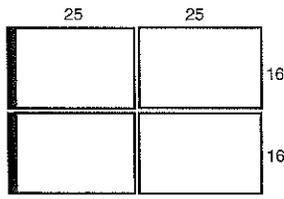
Flat Filter Arrangement — 2-in. or 4-in.
